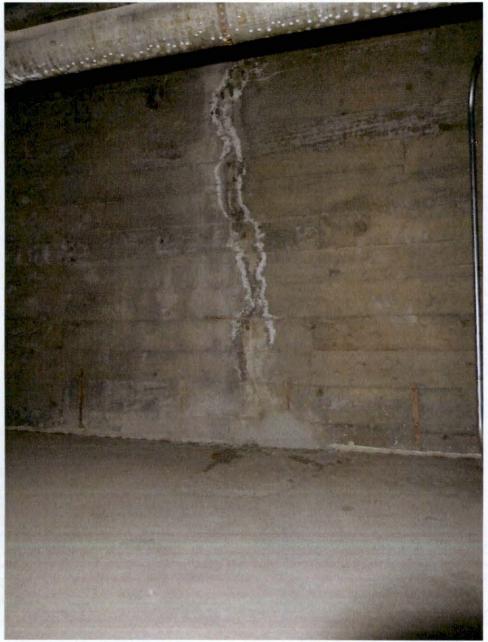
Vertical crack at concrete wall – Tenth Floor.
